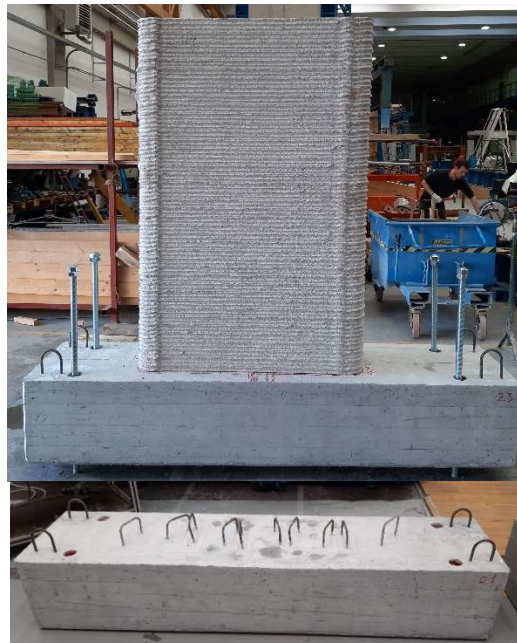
Detail of the foundation of the wall and of the connection between the wall and the foundation.
